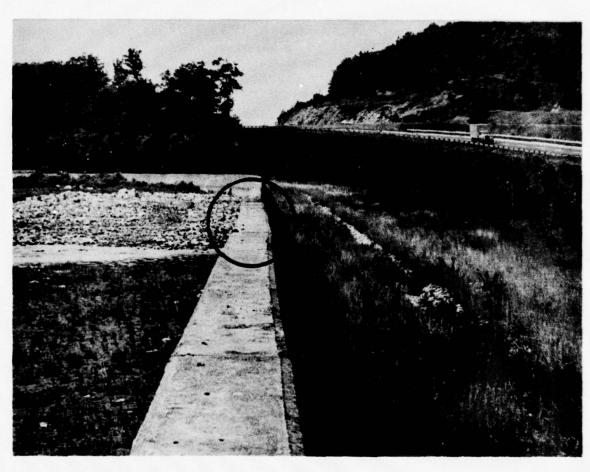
View of top of wall looking west showing horizontal misalignment of monolith. (Photo taken August 3, 1978).
